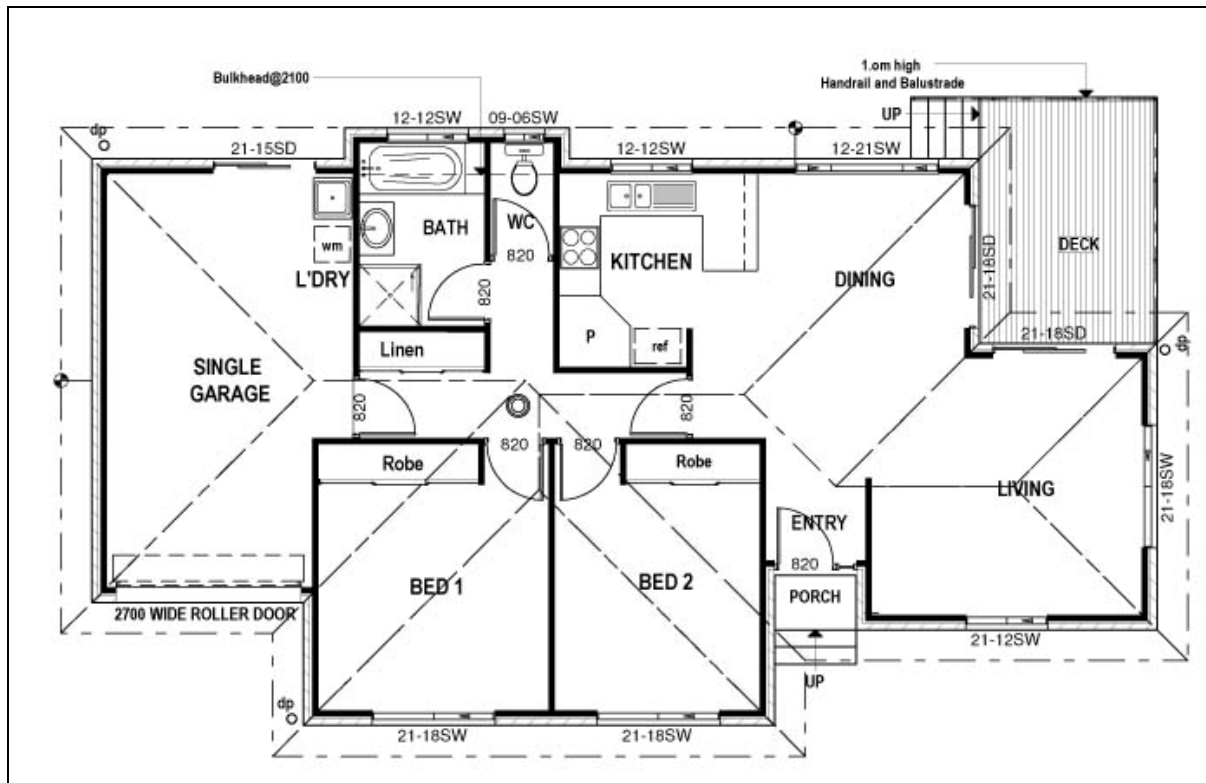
Floor plan layout of the test houses (Source: Wilson Houses)
